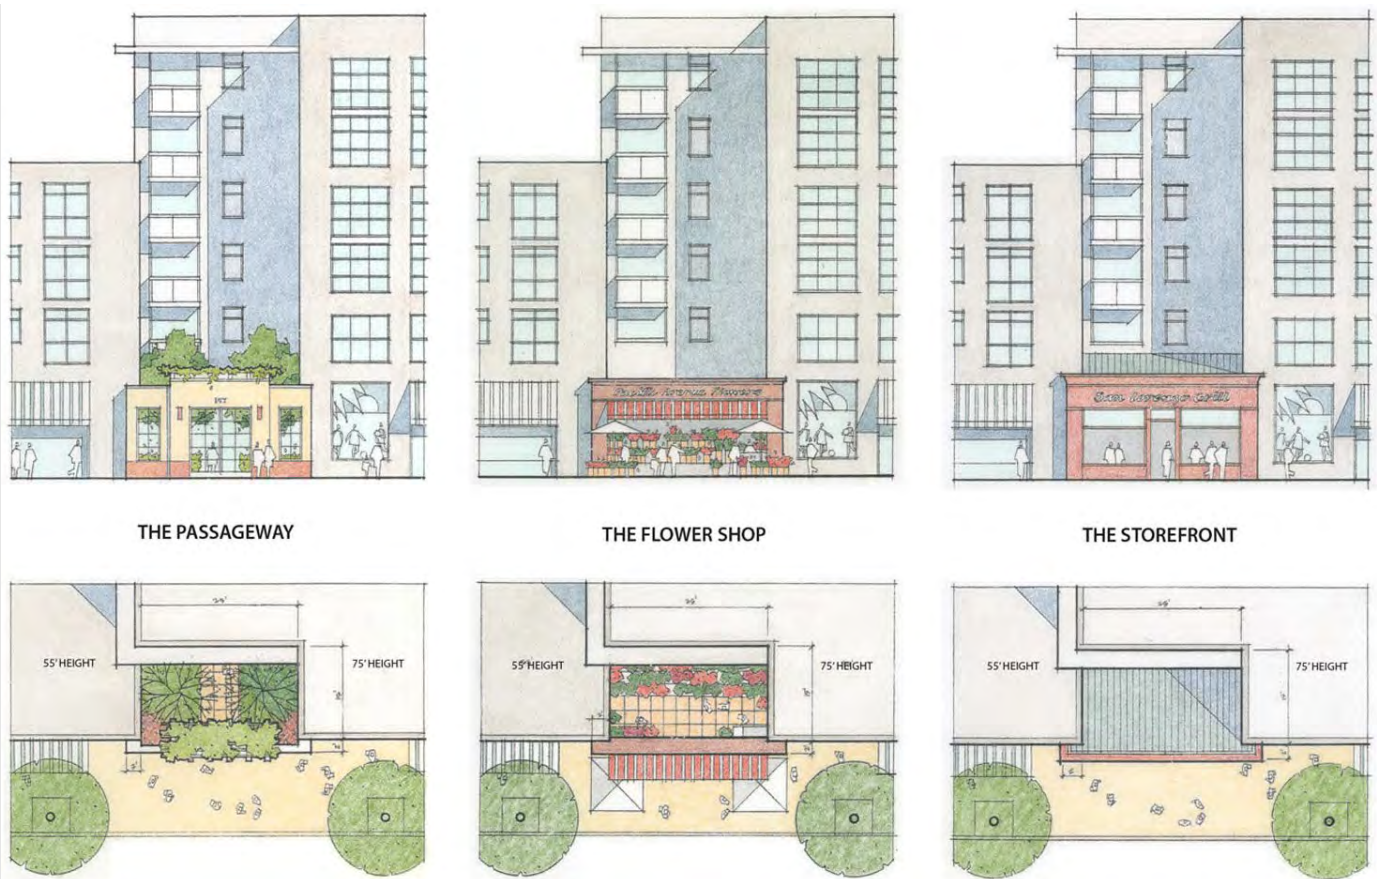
Recessed spaces along the streetfront must provide a clear visual break between building volumes, while creating a positive streetscape environment. Three examples of potential treatments.
